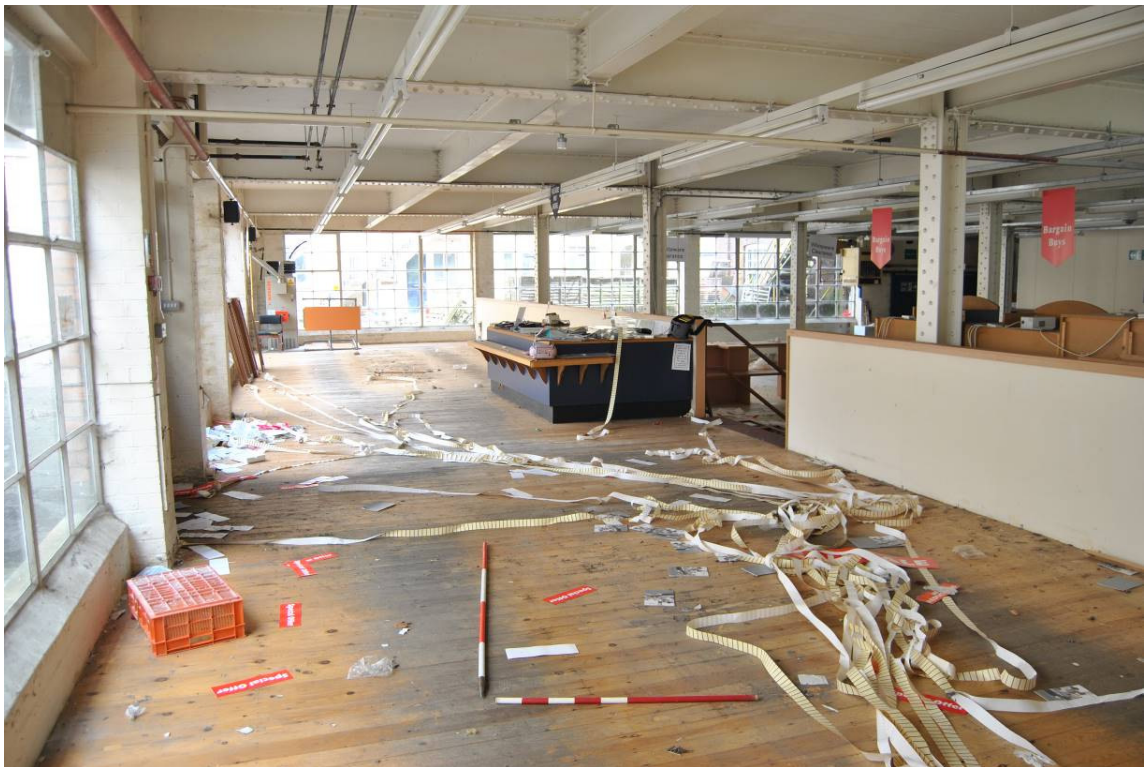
Ground floor (north), with secondary suspended floor, looking east.
